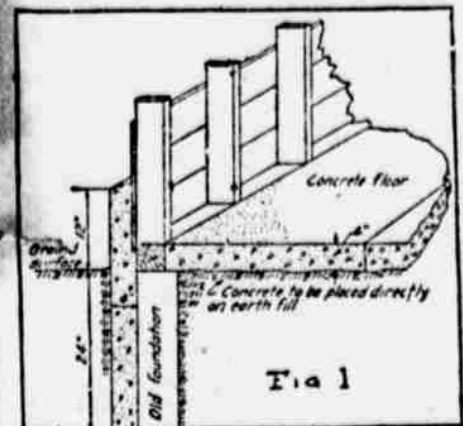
How an Old Foundation May Be Ratproofed and a Concrete Floor Installed.
